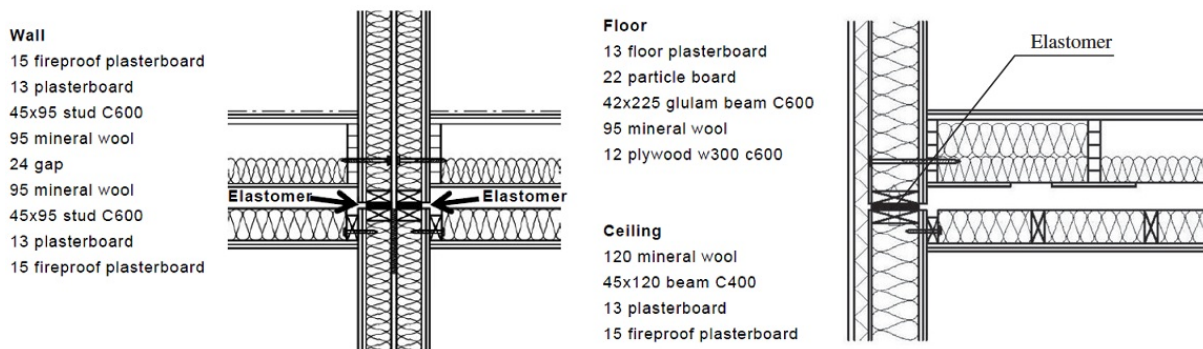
Drawings of the TVE building system, showing sections of a floor-ceiling structure and junctions with an apartment separating wall (left) and a façade wall (right).
